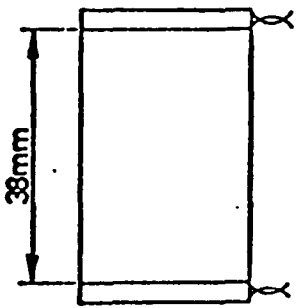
INSTRUMENT LAYOUT, PAVEMENT NO. 3
